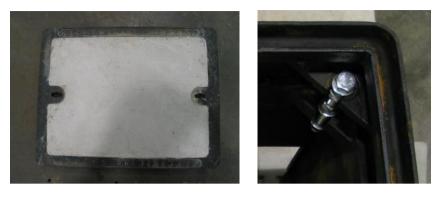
Cast Iron lid and the bolts provided with the pit frame
